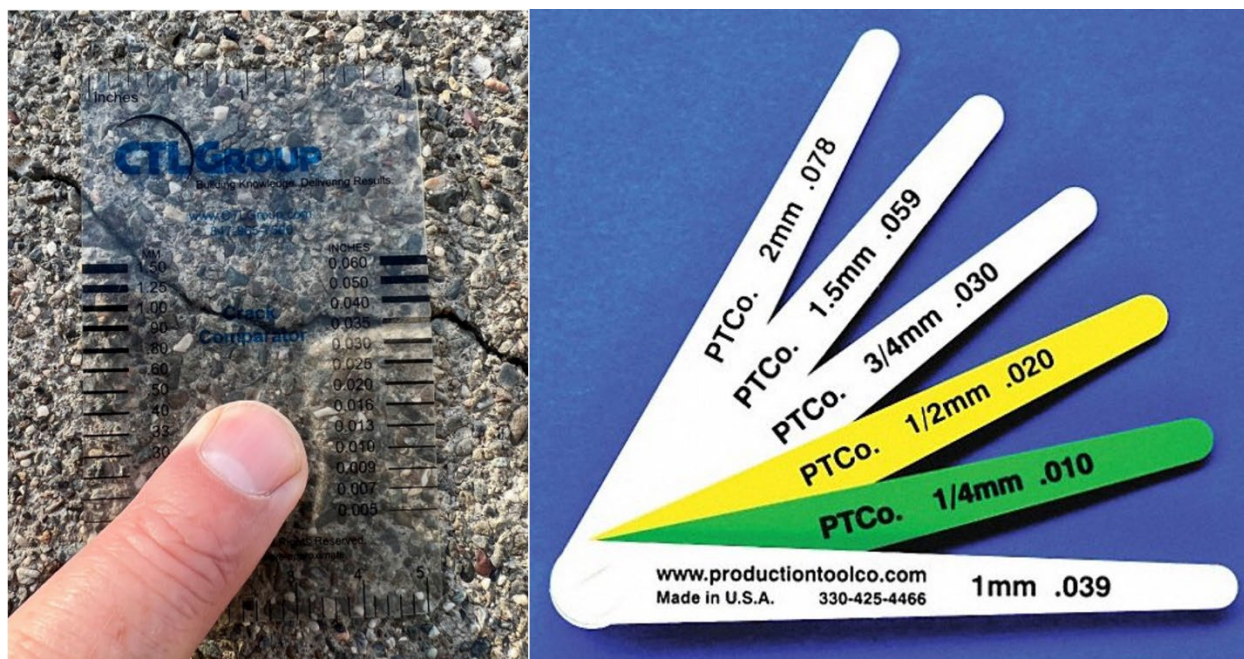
Tools used to Measure Cracks in Concrete
